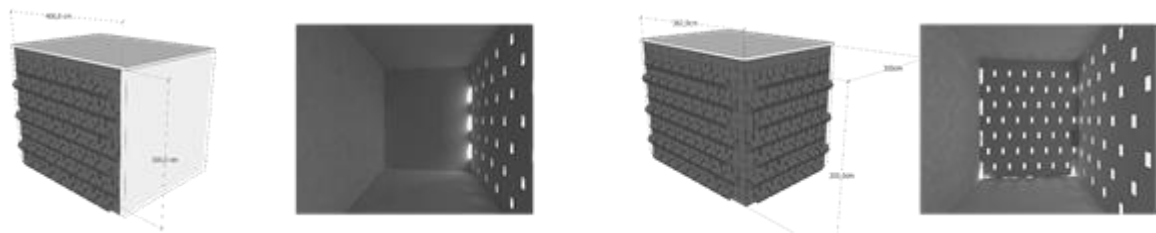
Room model, using modified design 2 with one-sided and two-sided opening walls
